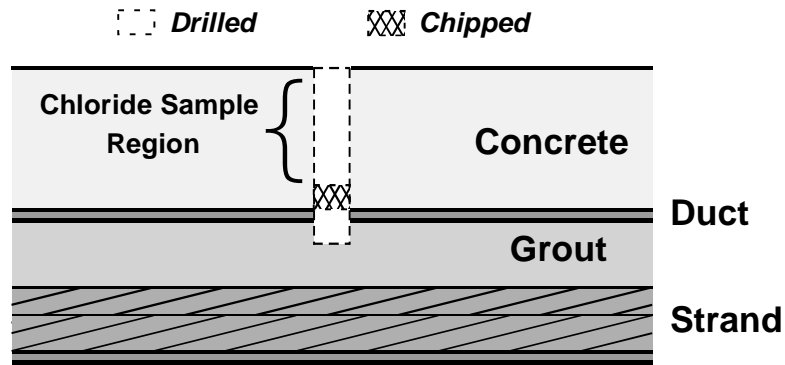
Details for Post-Tensioning Duct Inspection
